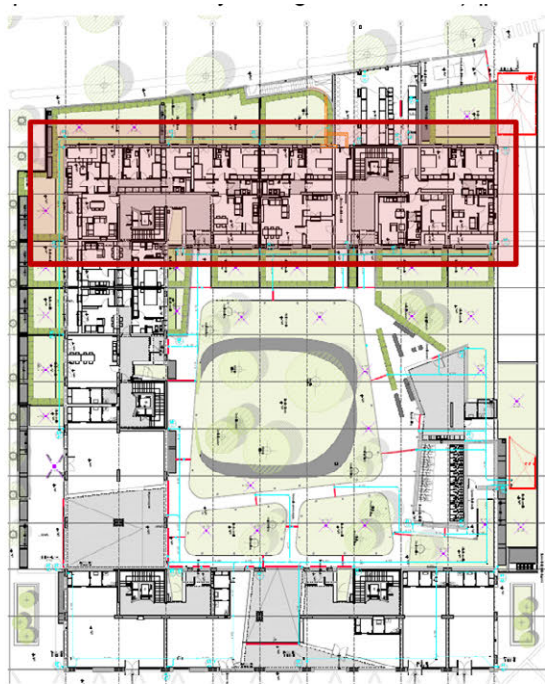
Detailed plan of the apartments and typical section of the floor (red).
